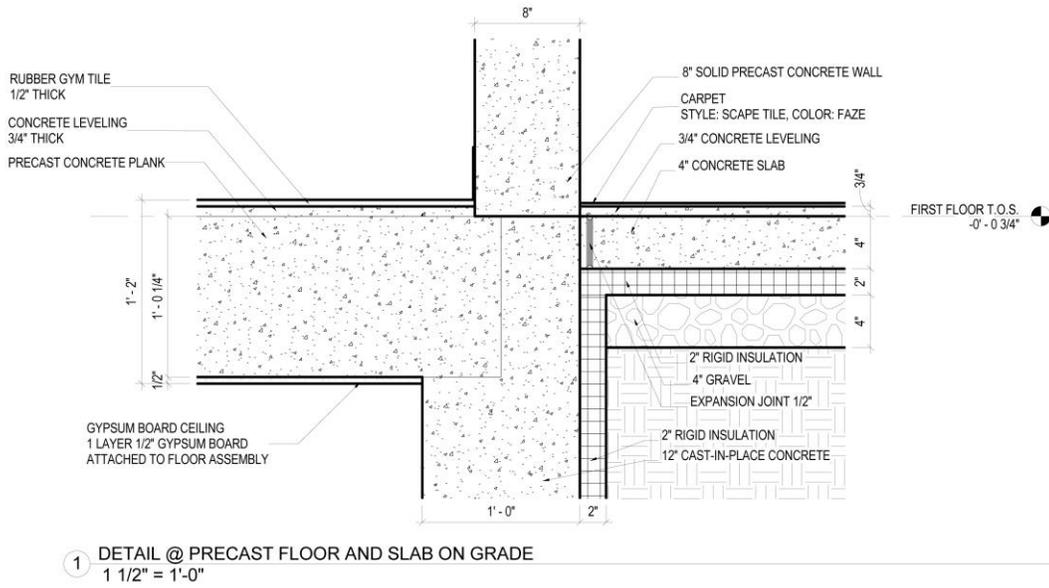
Precast plank to wall detail at grade. Due to the slope of the site, the building has a basement level lobby and café, which “walks out” to the sidewalk. This work is coordinated with a cast-in-place slab at the rear of the building.
